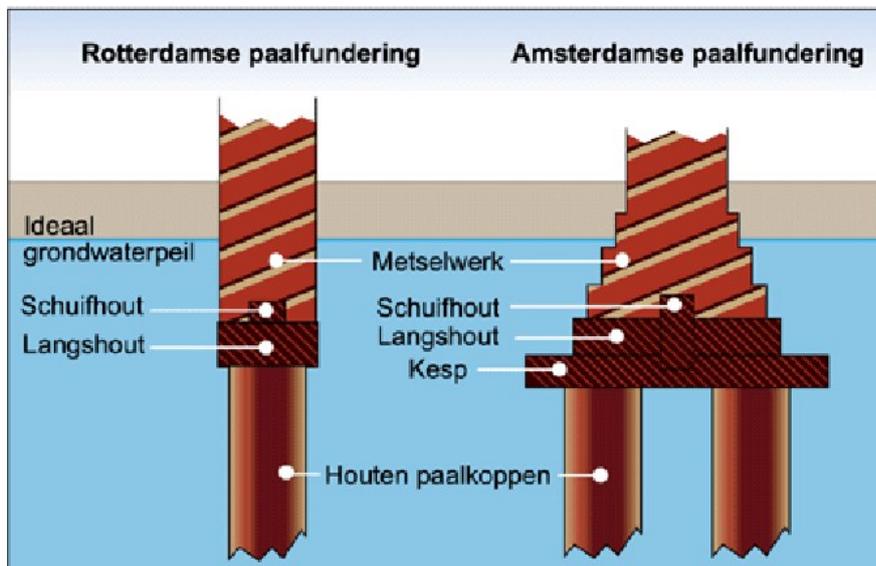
Schematic wooden pile foundation (Source: Platformfundering.nl)
